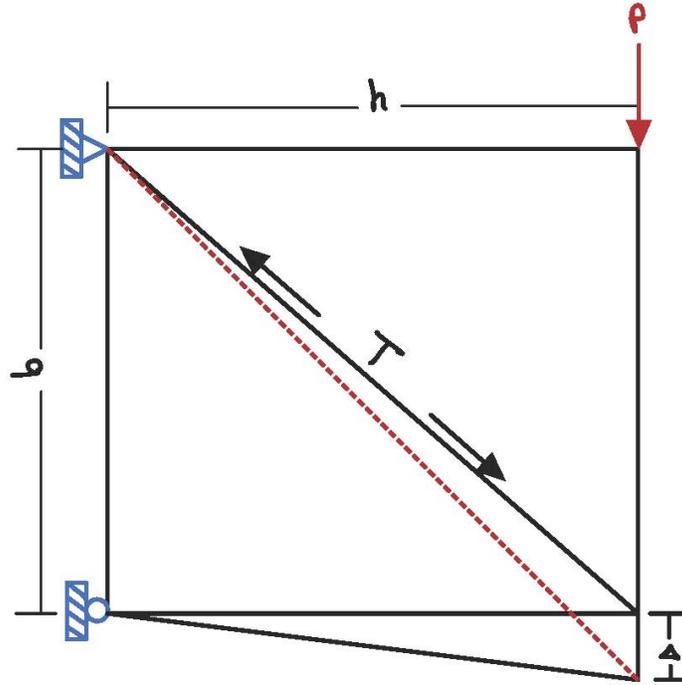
Truss sample highlighting the main dimensions utilized in deck modeling truss elements method .
